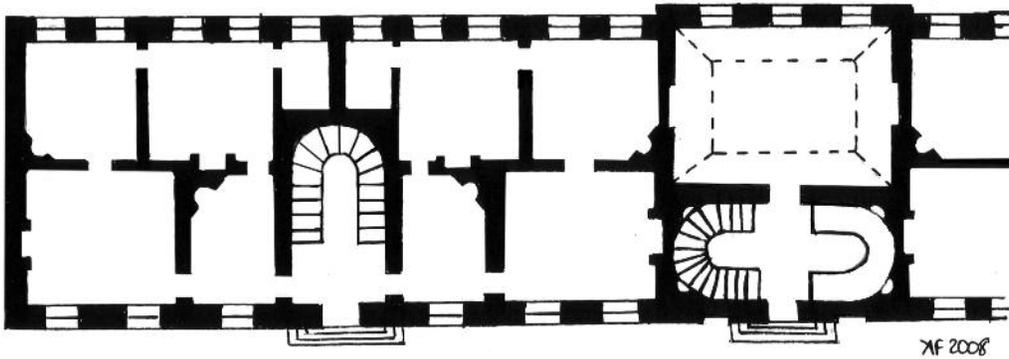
Reconstruction by author of Talman's first plan for the residential building at All Souls (after Worcester College 37).
